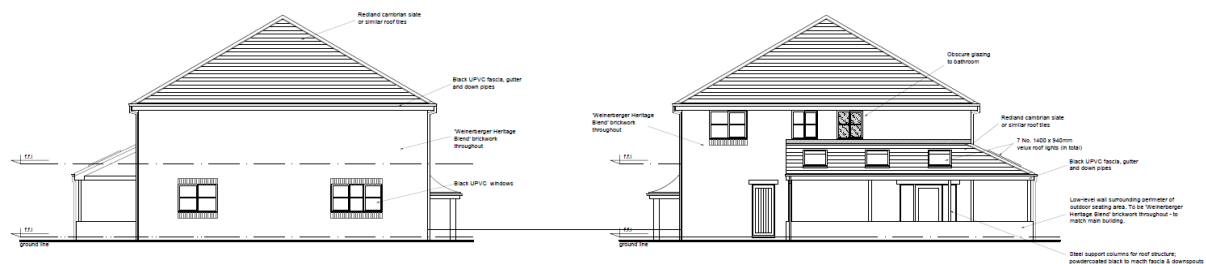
Excerpt from 01823-SK-02 showing Side Elevations (Left-side elevation = Left image; Right-side elevation = Right image)
